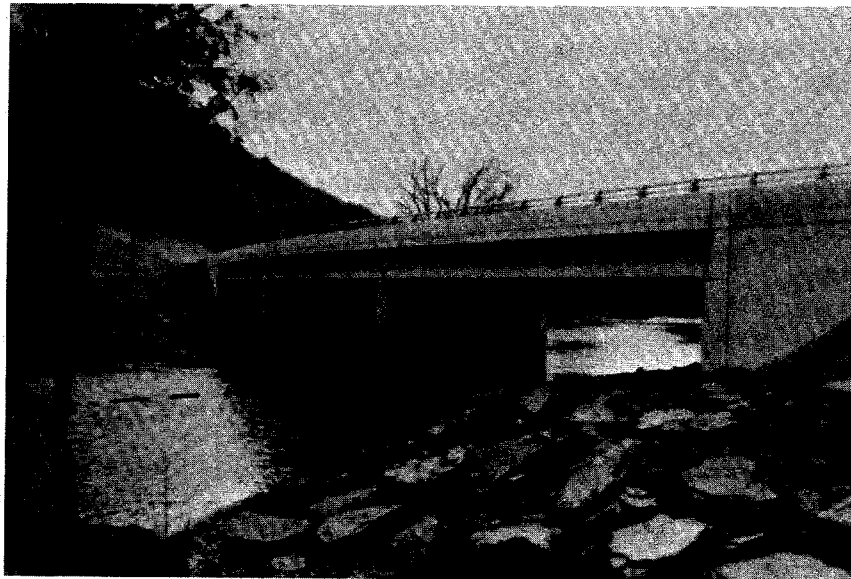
View from right bank upstream of bridge. Drainage channel and riprap protection in foreground. Photographed in 1976.
